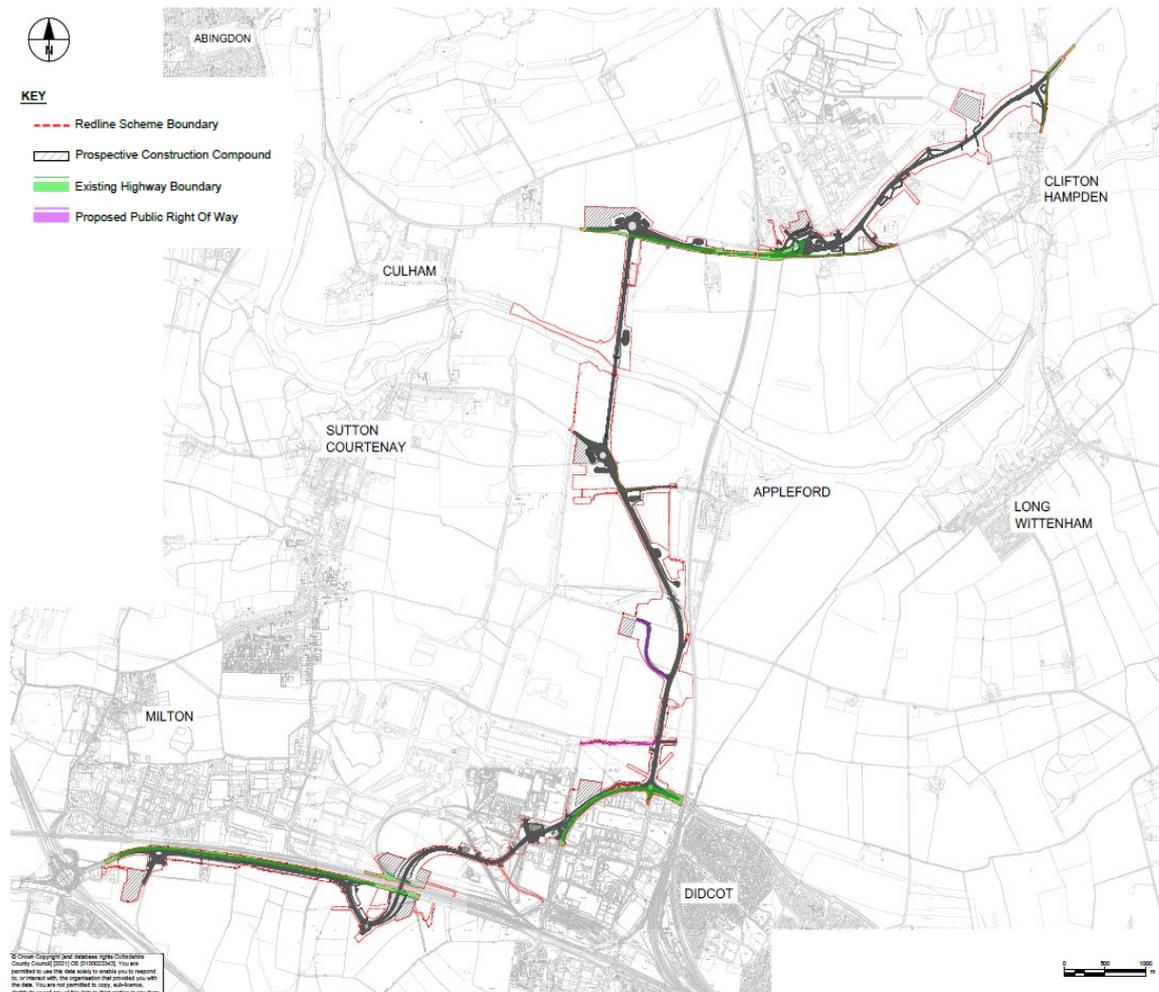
Site Location Plan (extract from drawing, GEN_PD ACM HGN DGT_ZZ_ZZ_ZZDR T 0040 P02)
